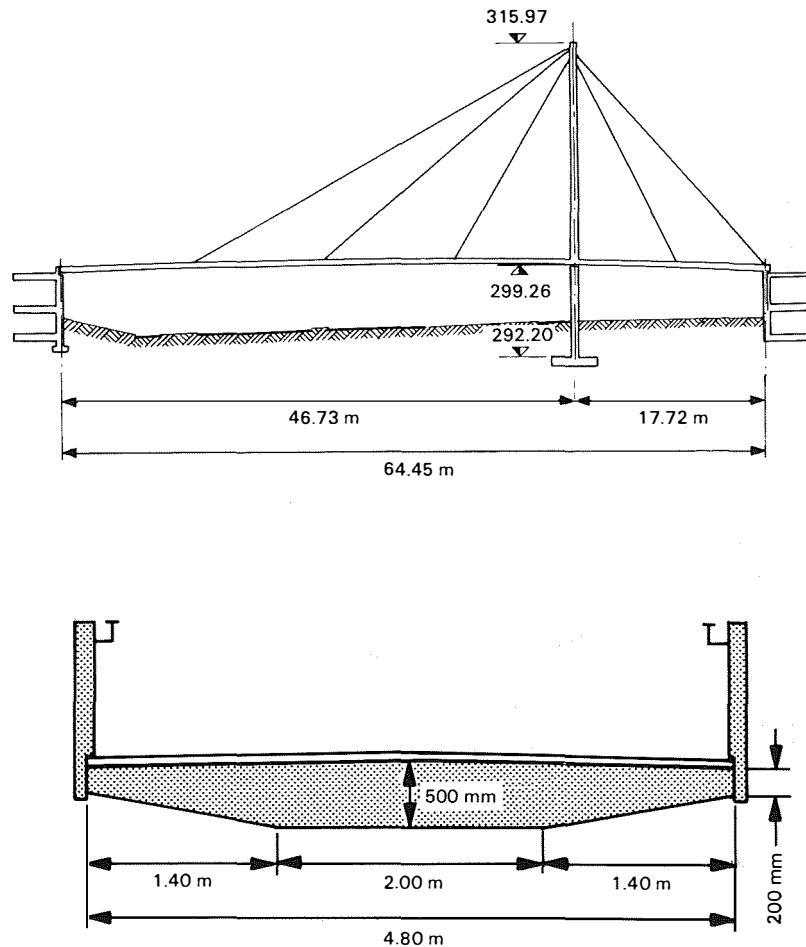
Footbridge Liebrüti, elevation and section. (Courtesy of H. U. Aeberhard, VSL International.)
